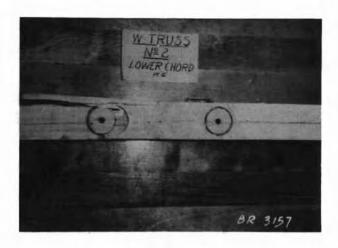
Failure in lower chord member of W-truss No.II, top view of member
